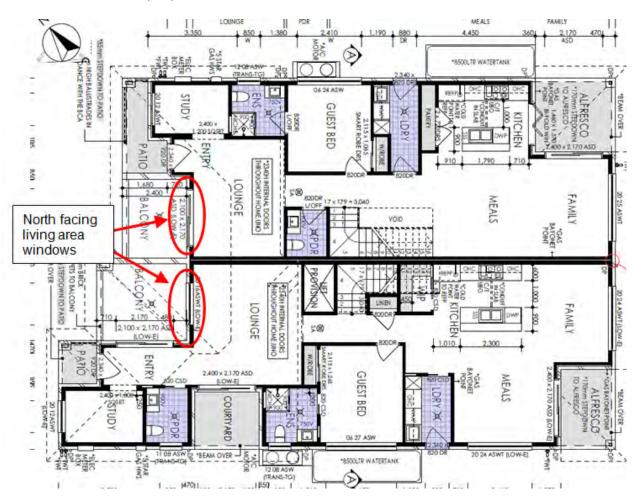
Extract of Ground Floor Plan showing north western facing living area windows.
